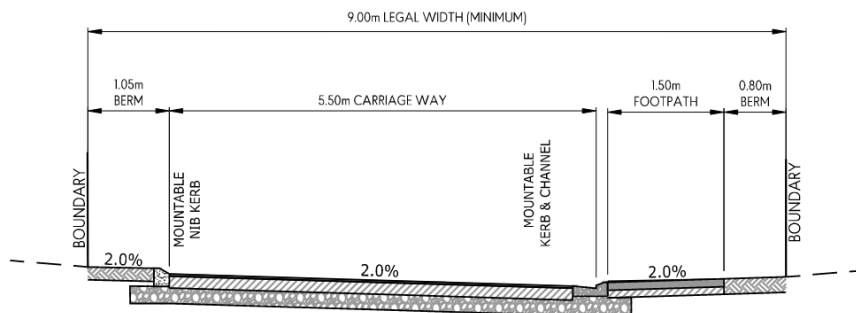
Typical JOAL Cross-Section (1) - 9.0m Minimum with Footpath
